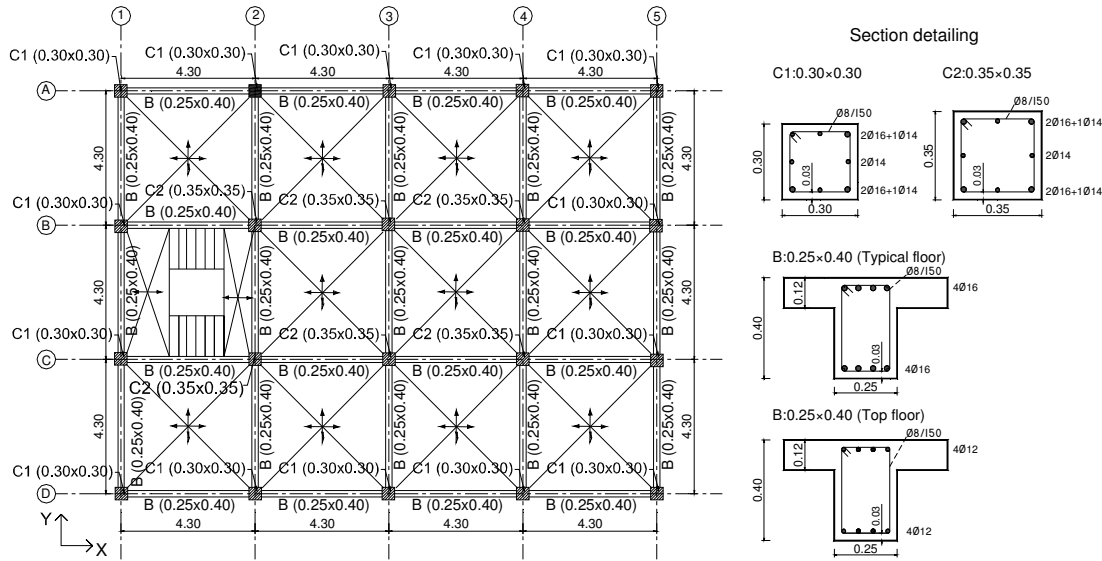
Plan view of a typical storey of the 3-storey, 4- storey and 5- storey buildings and the design details (all dimensions are in m).
